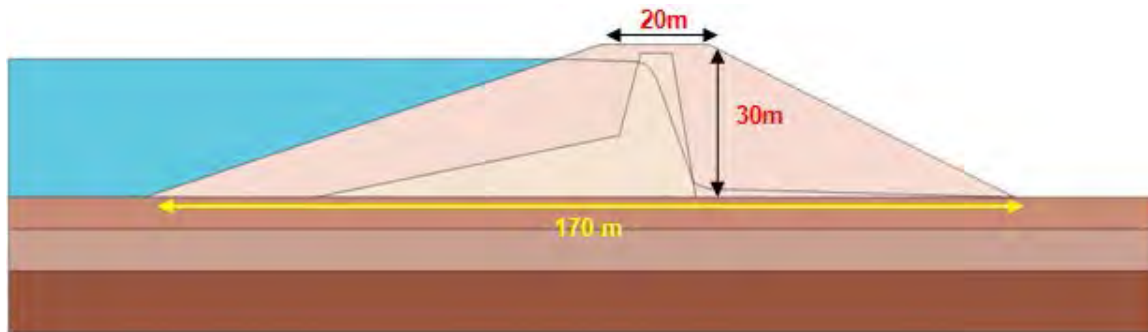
Cross Section View of the Carsington Earth Embankment Dam model, showing the internal water piezometric surface trajectory, based on provided dimensions (On exact Scale).
